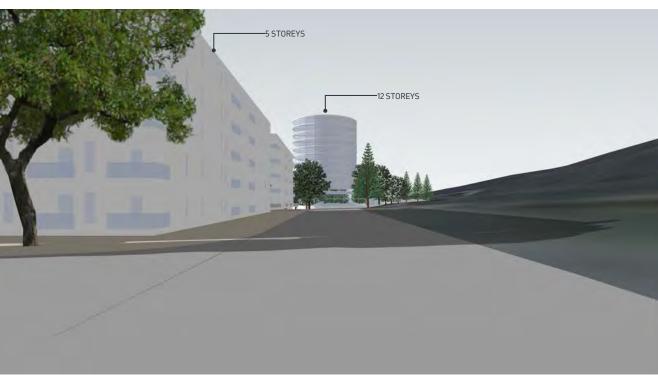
Indicative Built Form (12 Storeys) - Adelaide Crescent looking East
